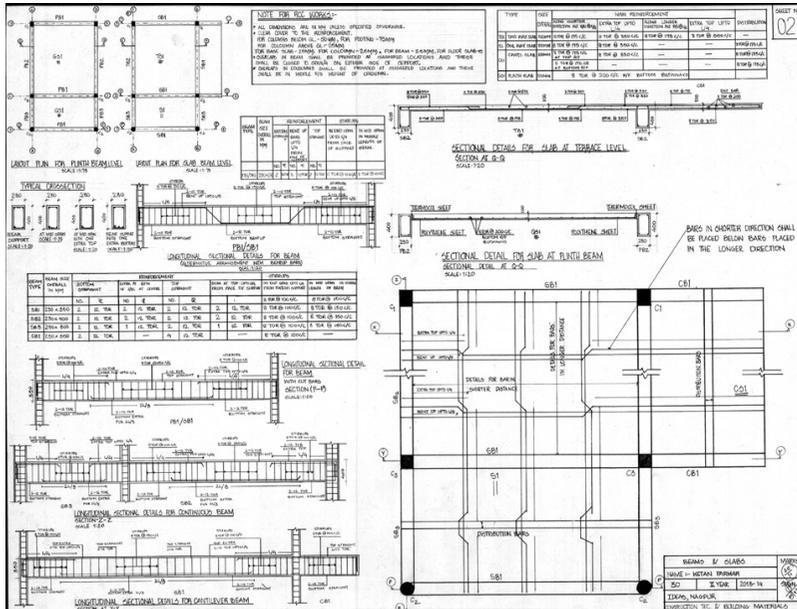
Graphical Expression of design and construction R.C.C slab and beams (Image Source: Authors).
